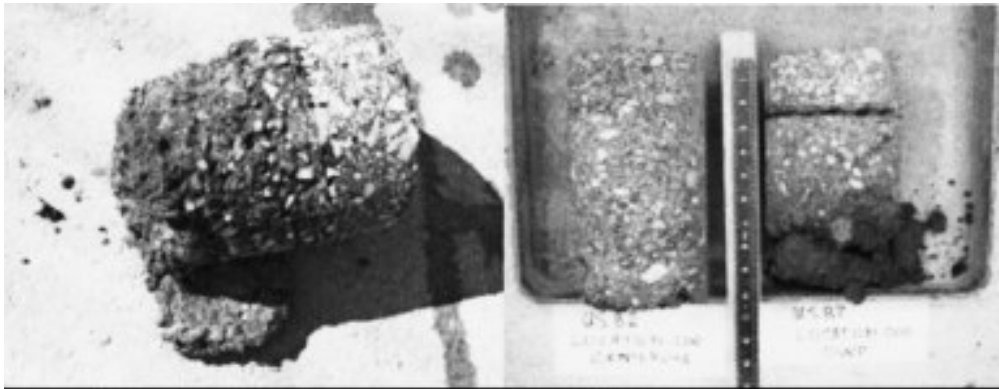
A deteriorating pavement core, an intact core from the road centre, and a deteriorating core from the outer wheelpath
